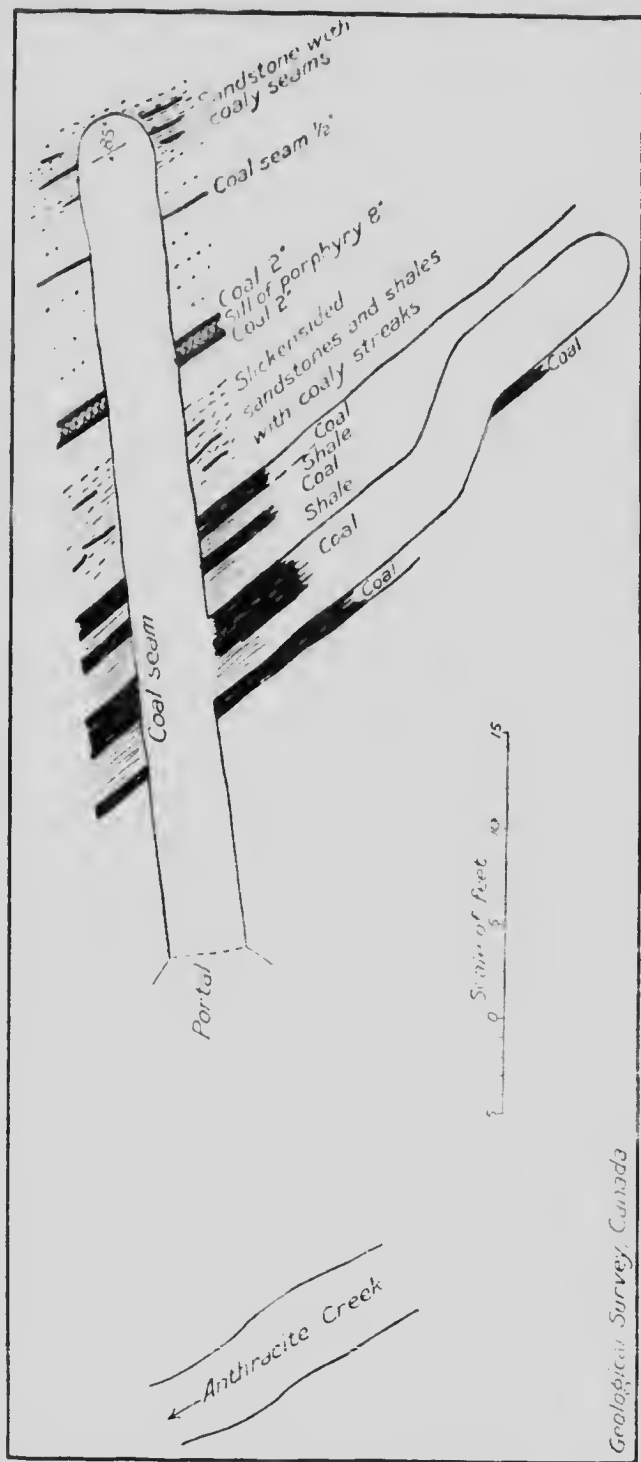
Camp Anthracite. Plan of drift and crosscut showing geology.
